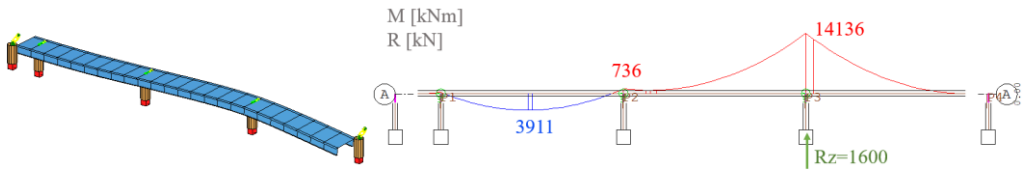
Critical position of the girder, bending moment diagram and support reaction
